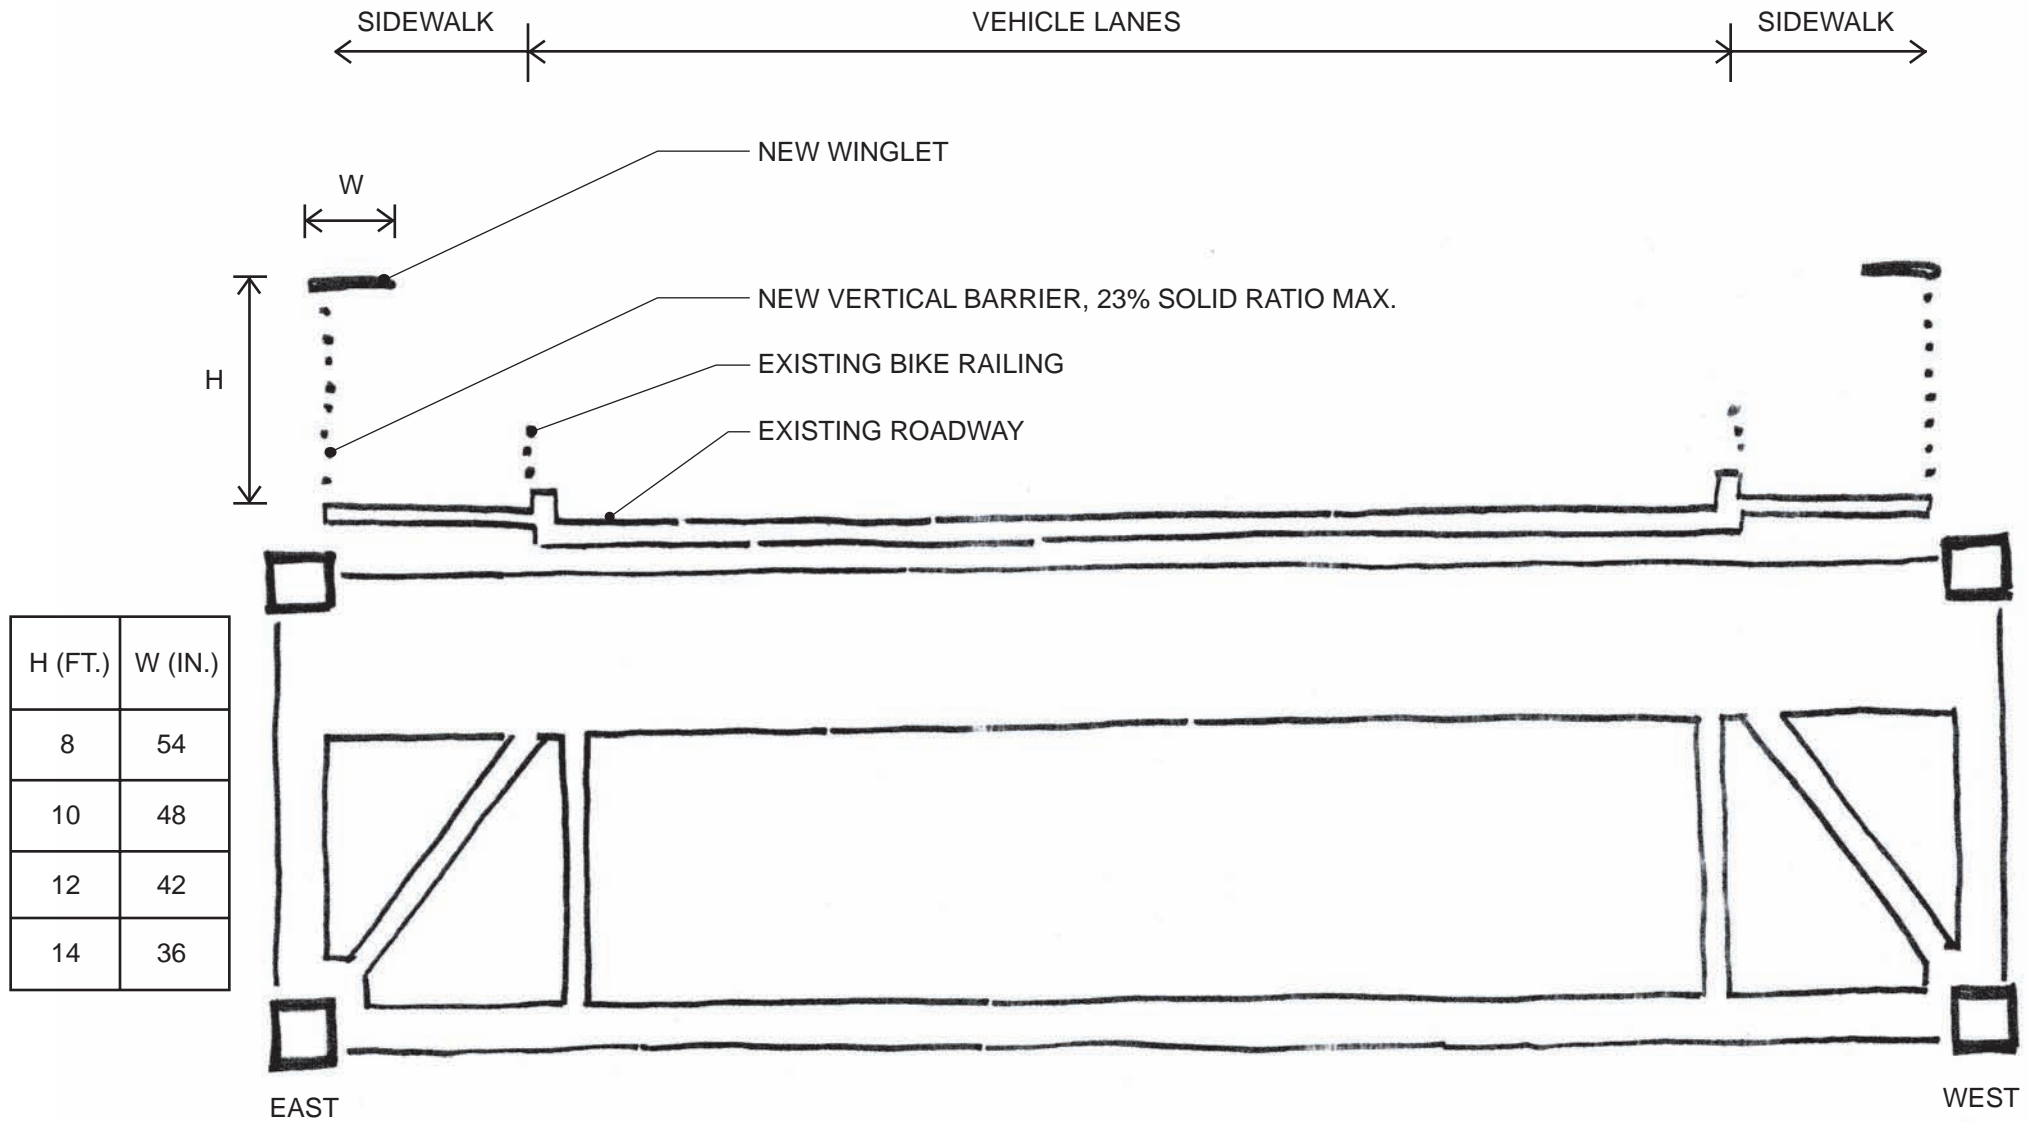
CONCEPT 2 : REPLACING THE EXISTING RAILING ; WINGLETS MOUNTED OVER BARRIER
